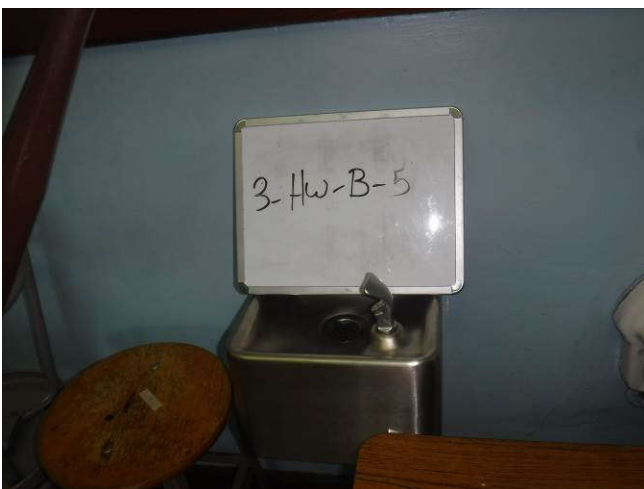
Bubbler located on 3rd floor hallway across from room 311 (left fixture)
